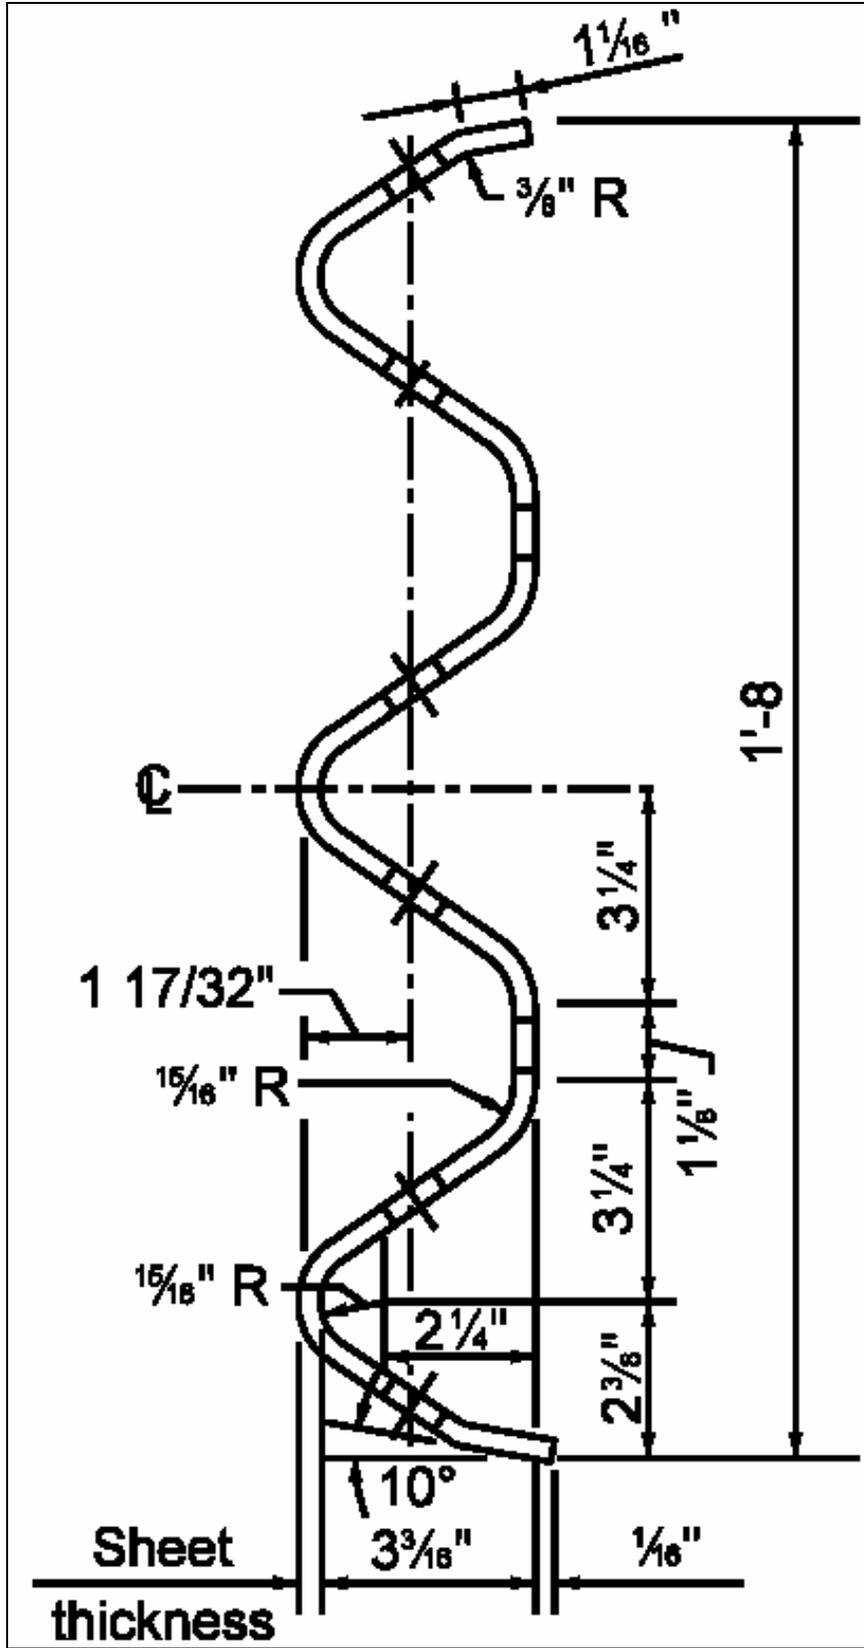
Typical Thrie-Beam Guardrail Profile (30).
